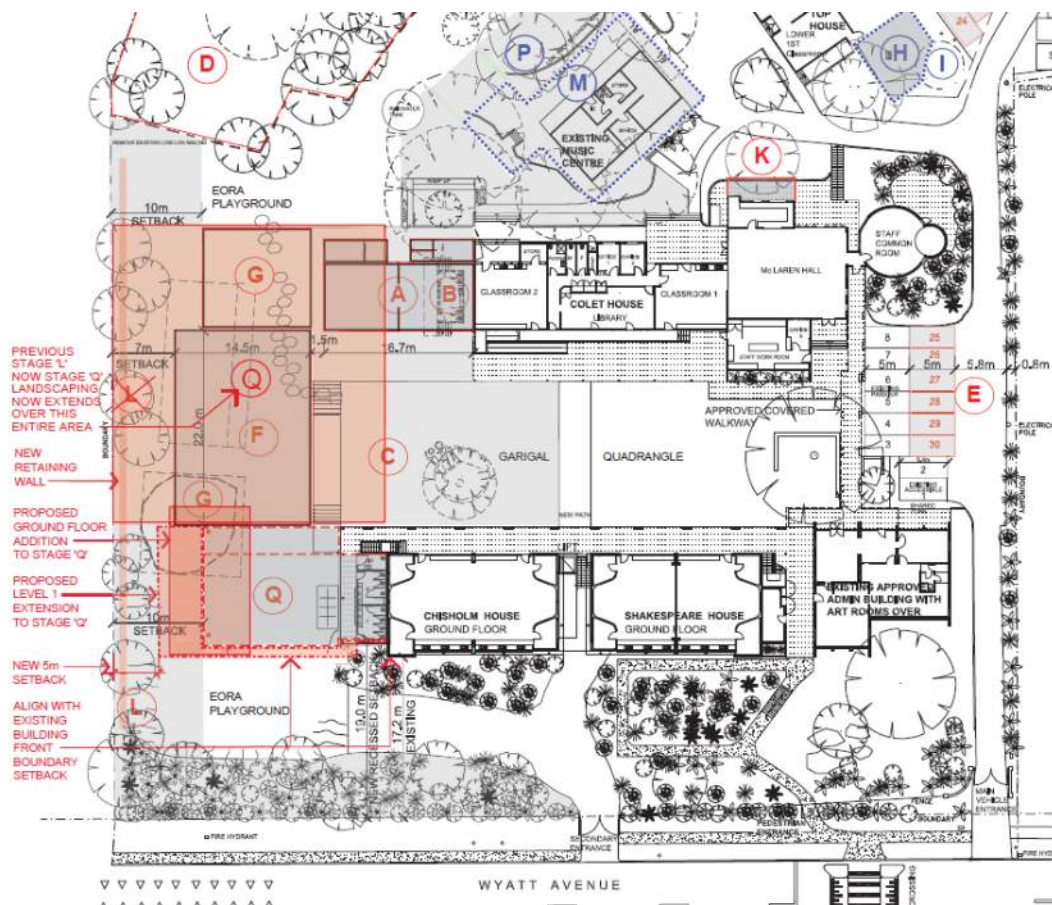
Amended Staging Plan/Masterplan (Source: Templum Design Architects)
